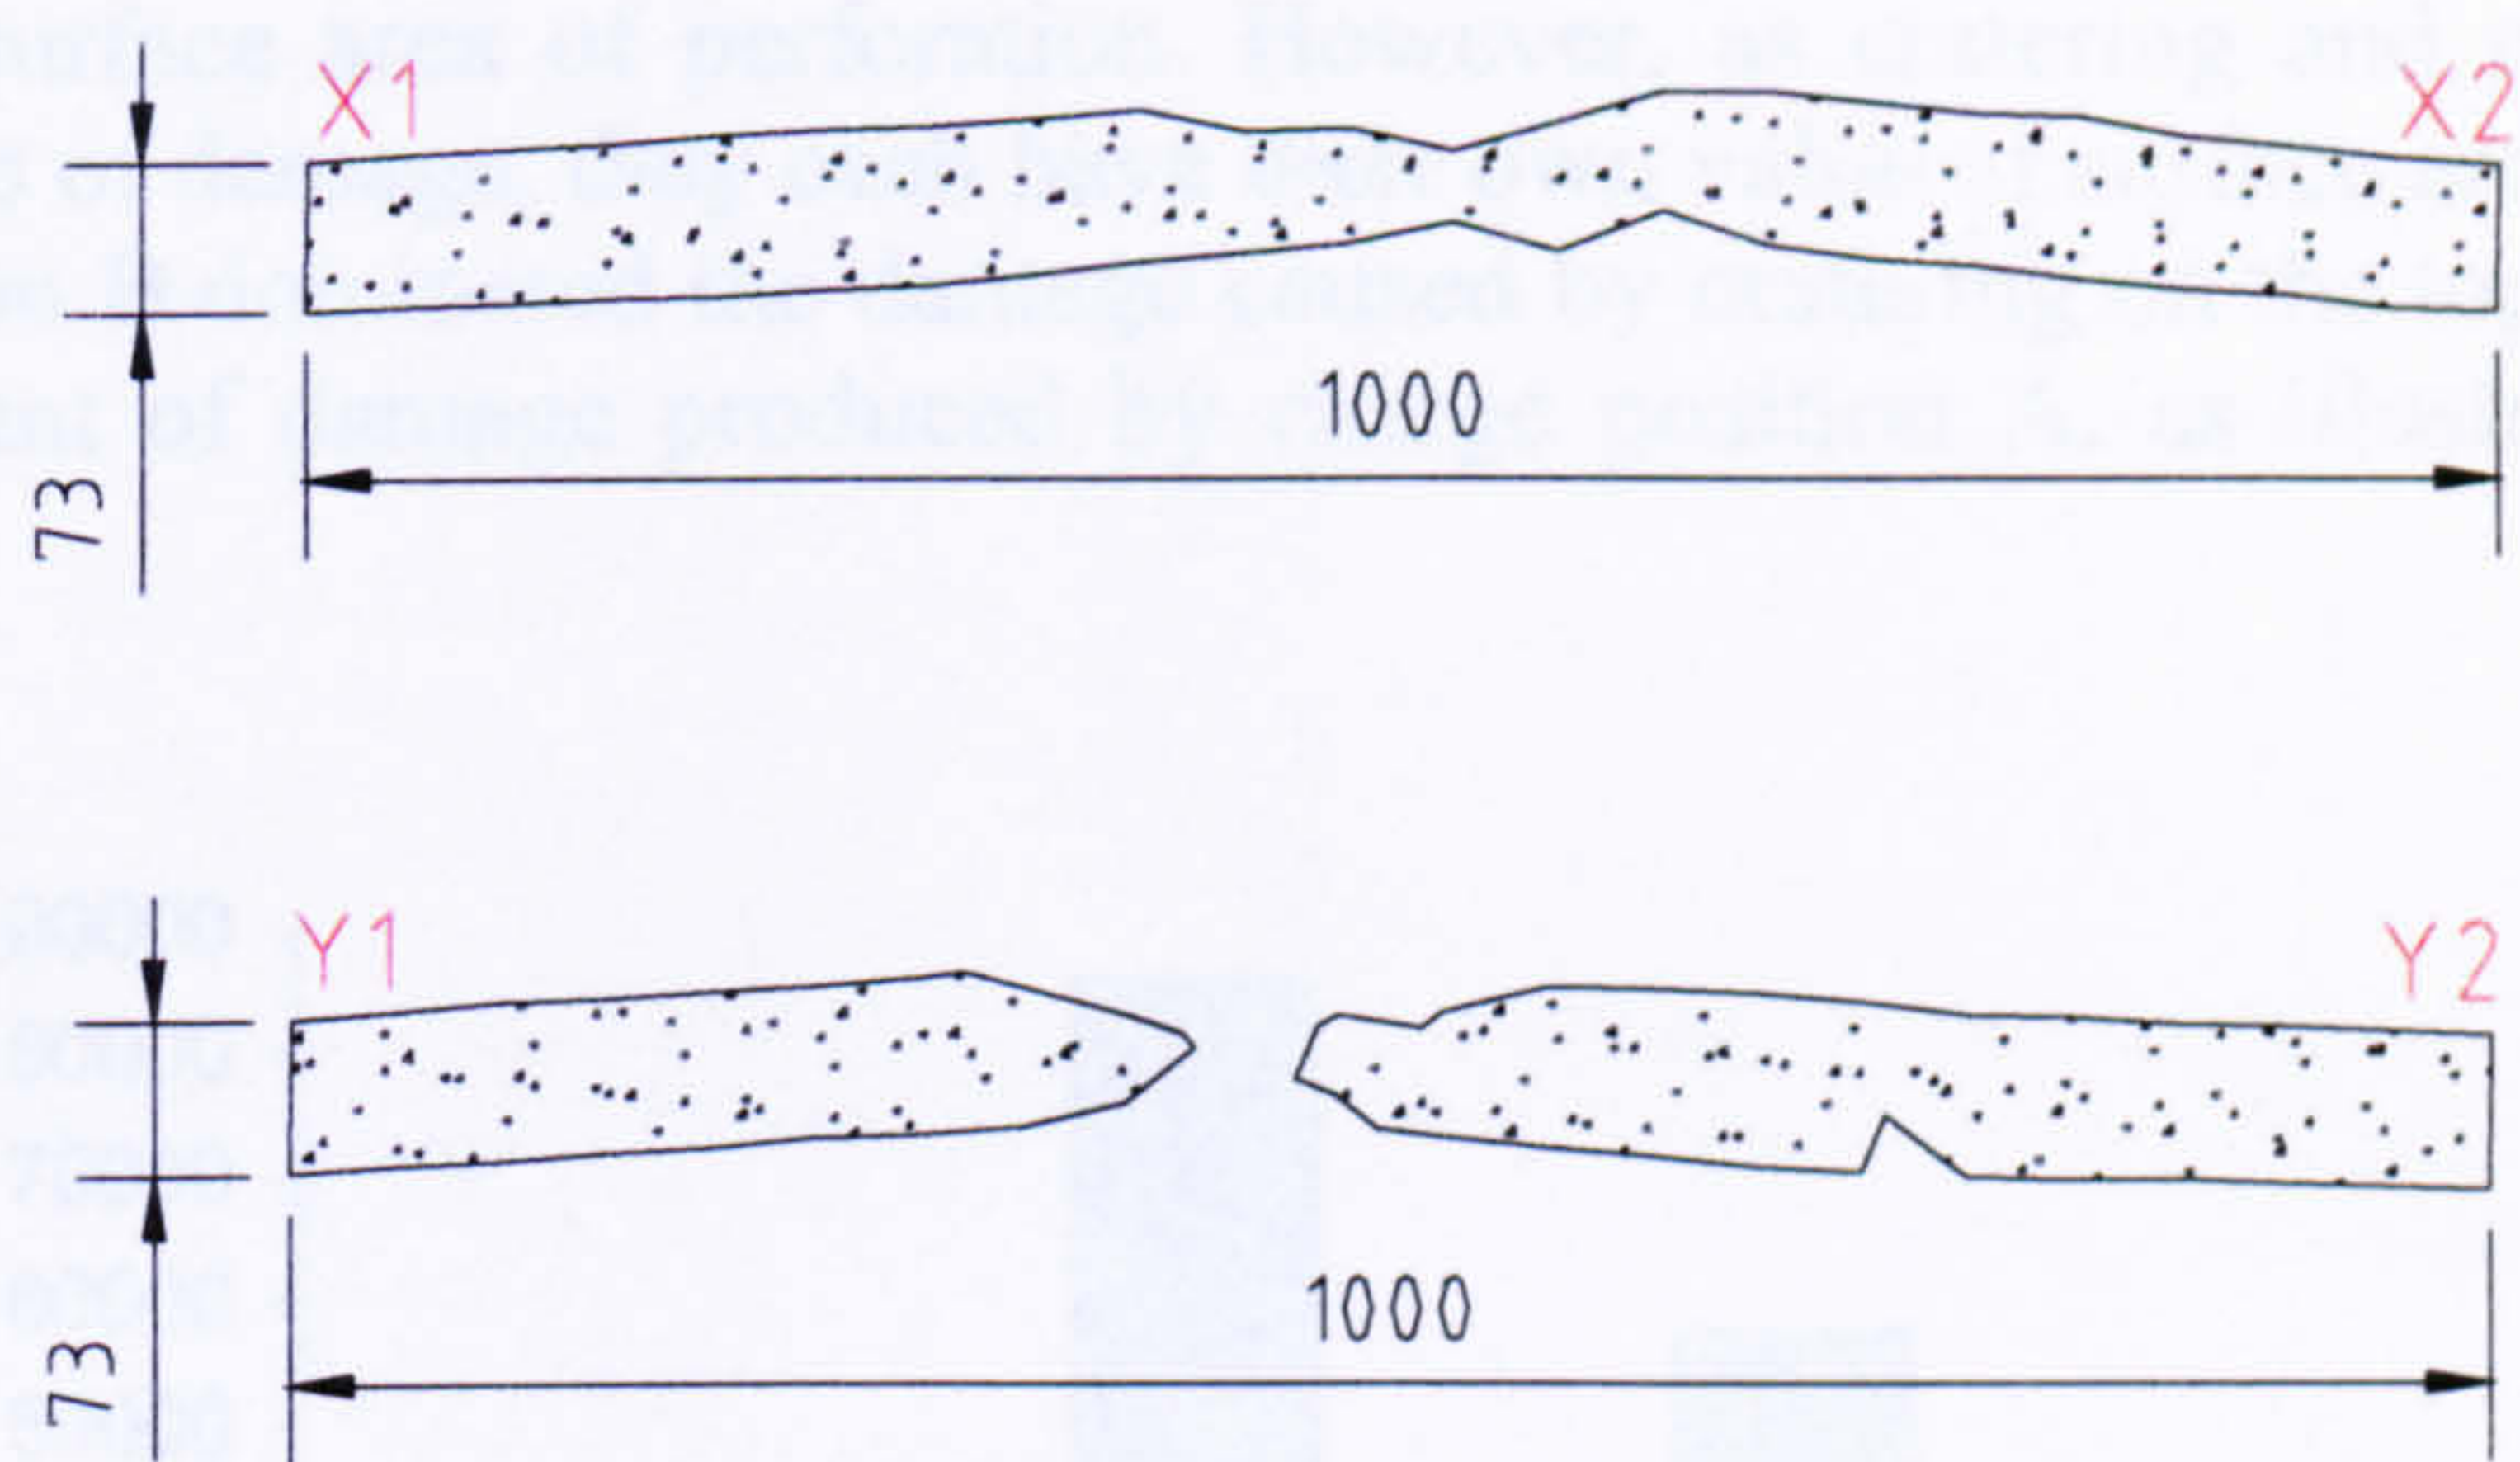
Cross-sectional elevation through X1-X2 and Y1-Y2 of secondary slab RCB73IT7
